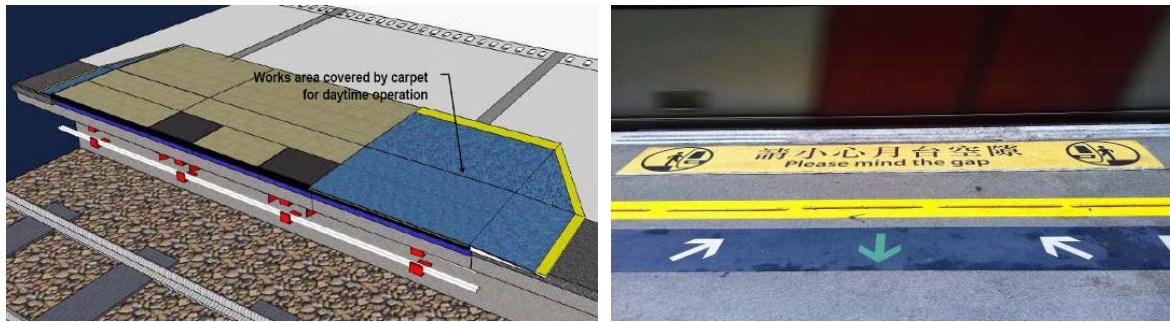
Enhancement of platform leveling with new floor tiles and floor markings
